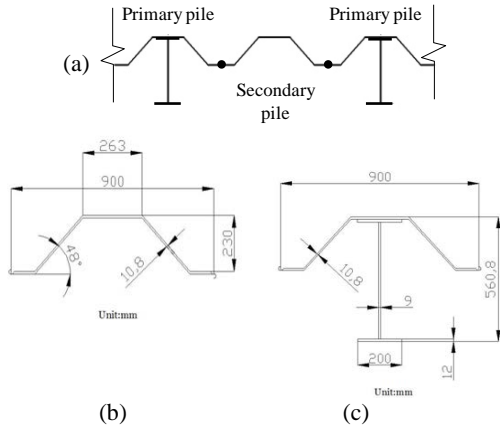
Illustration of (a) a combined wall used in a full-scale test (Nakayama et al. 2013): (b) a secondary pile and (c) a primary pile
